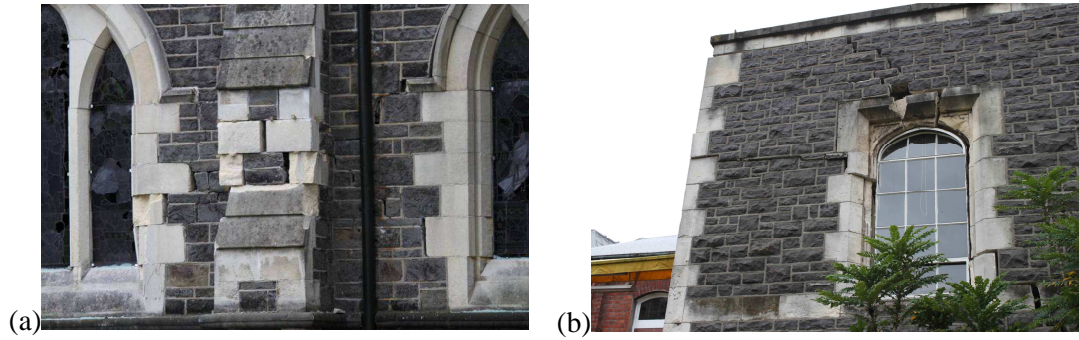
(a) Christchurch Anglican Cathedral: diagonal cracks in the south façade piers.
